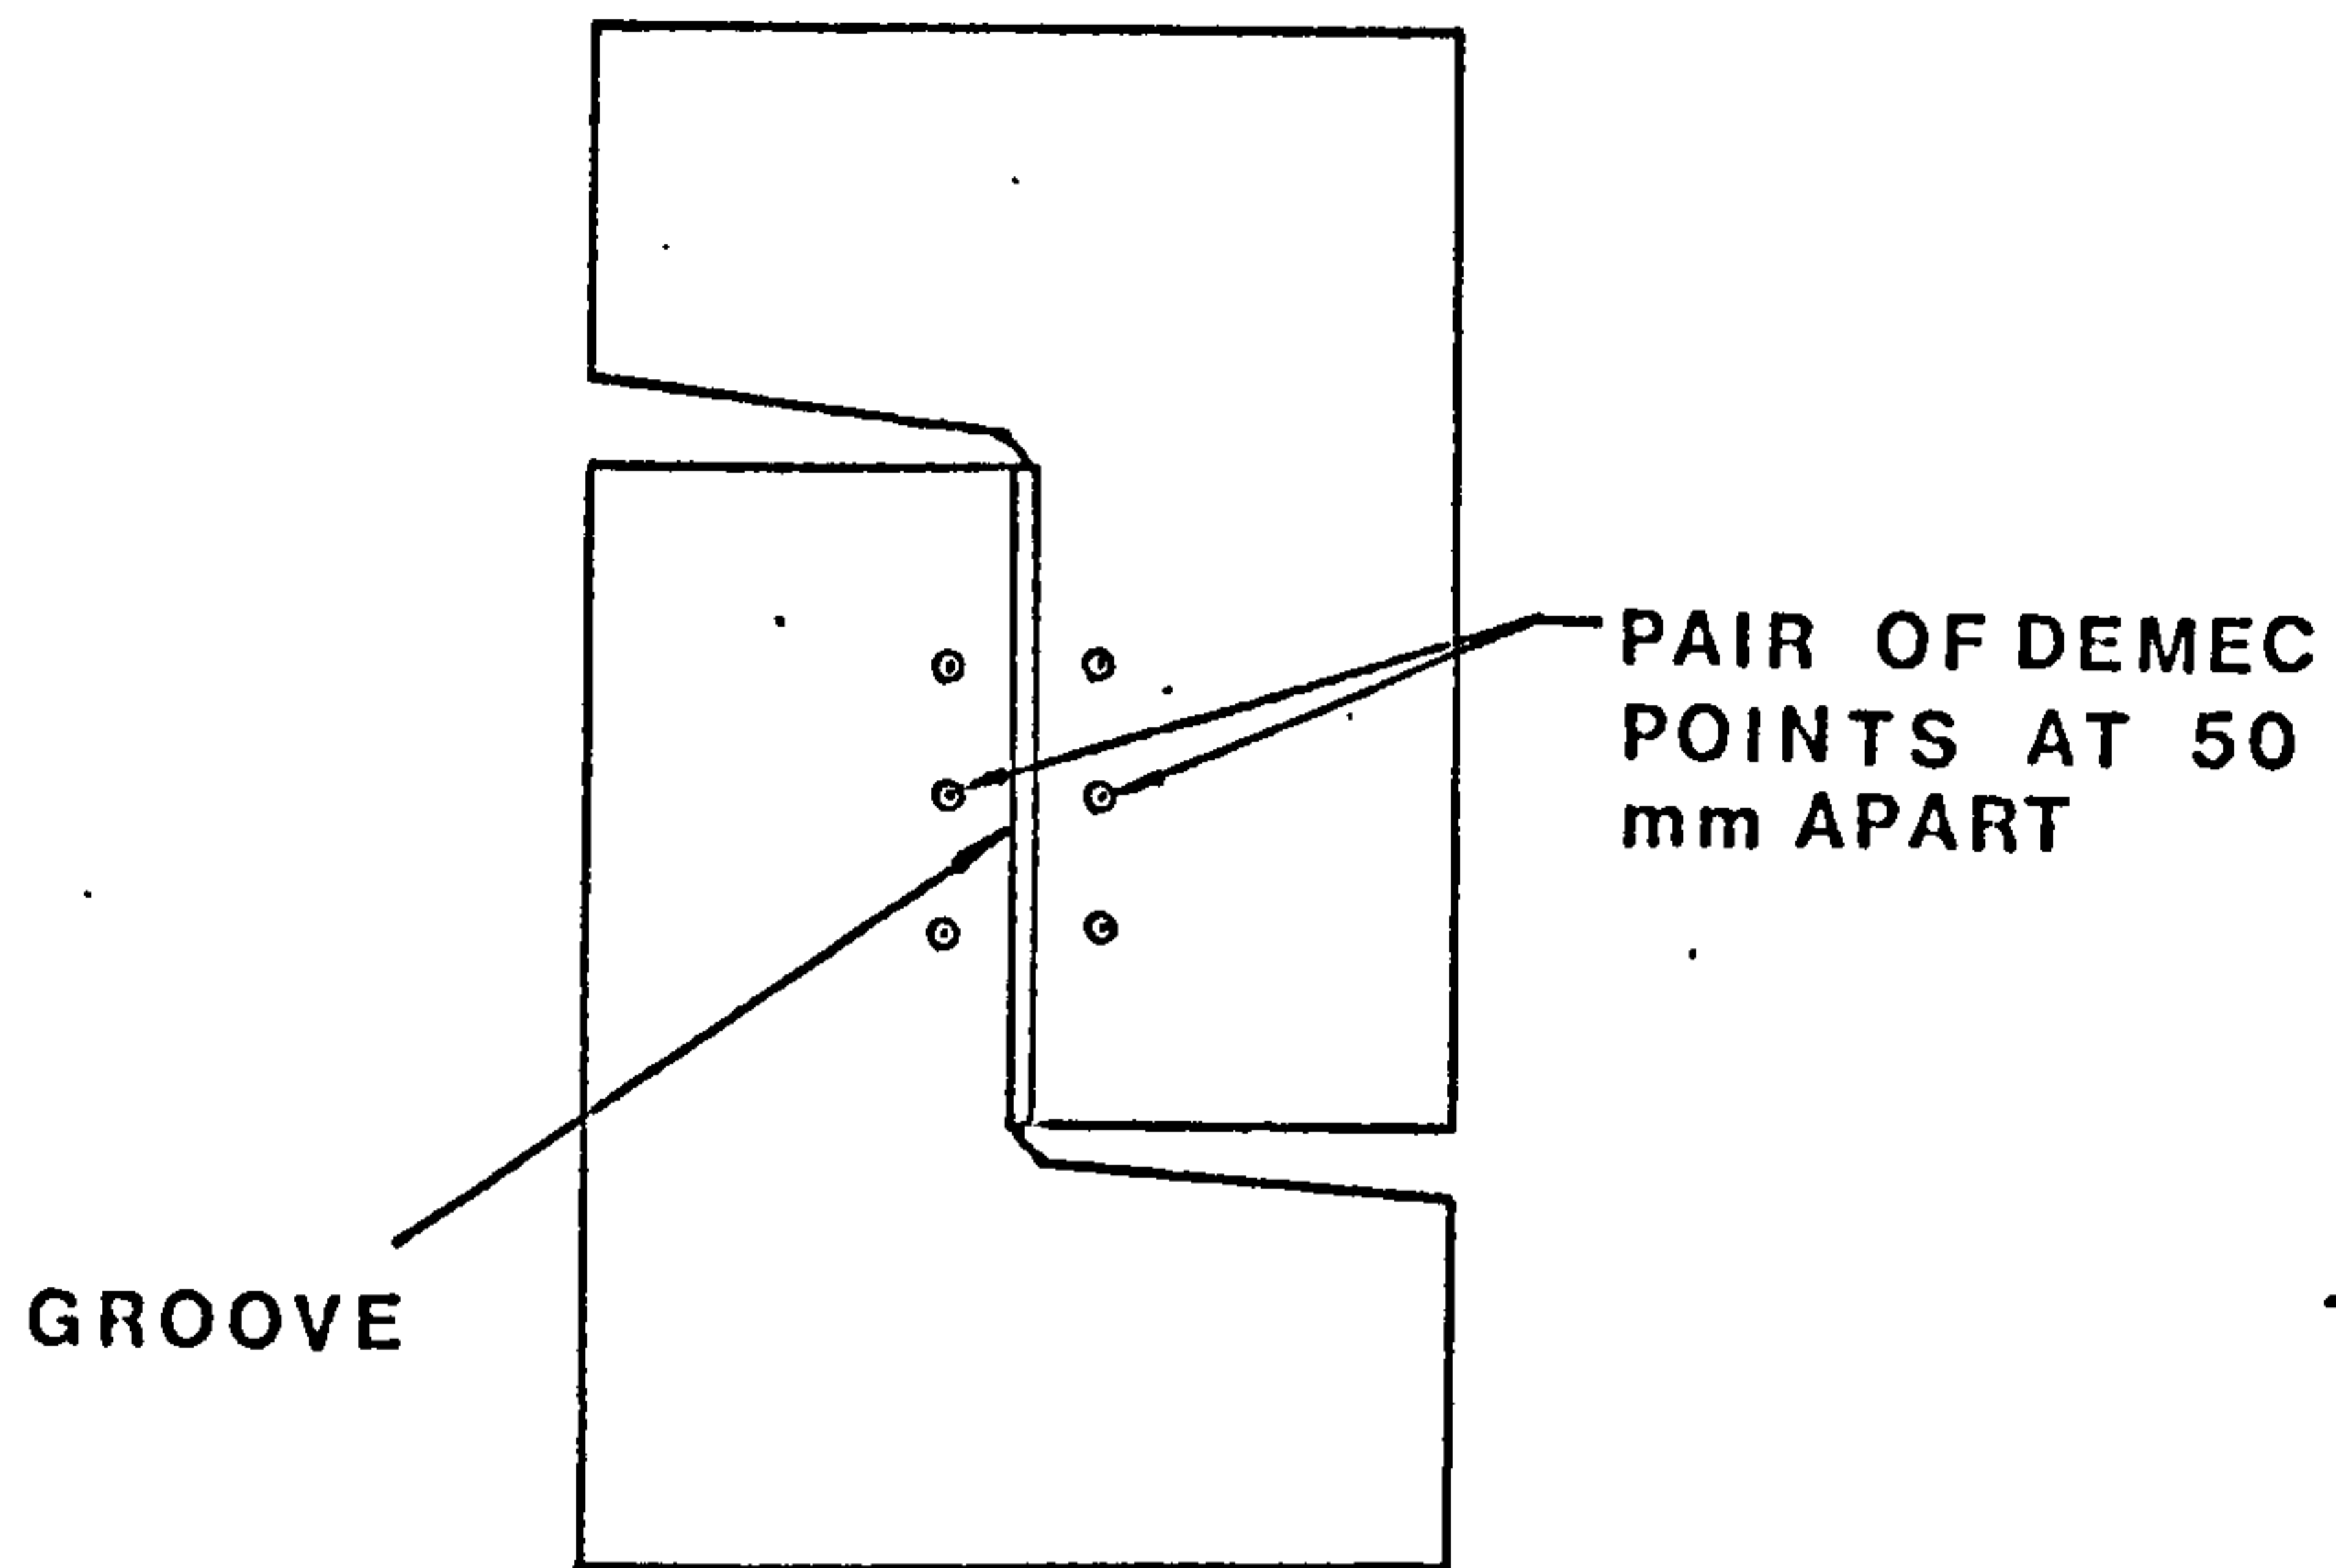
(a) DETAILS OF INITIAL CRACK WIDTH MEASUREMENT
